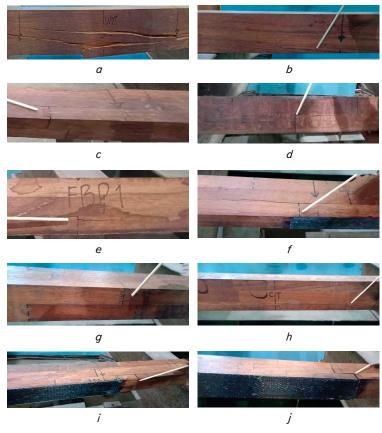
Failure modes of beams: a, b — solid beams; c, d — face butt beams without reinforcement; e, f — face butt beams with reinforcement; g, h — face finger beams without reinforcement; i, j — face finger beams with reinforcement
